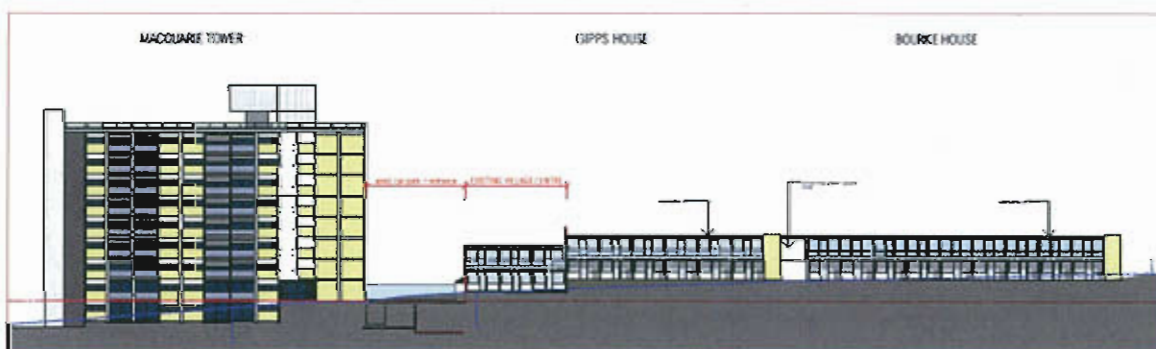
Existing front elevation of the existing development as viewed from Jersey Road
